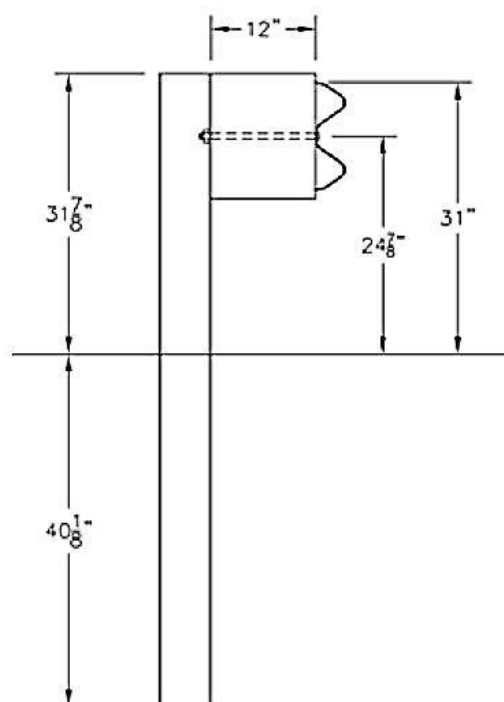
Typical Cross-Section of Midwest Guardrail System (MGS)
